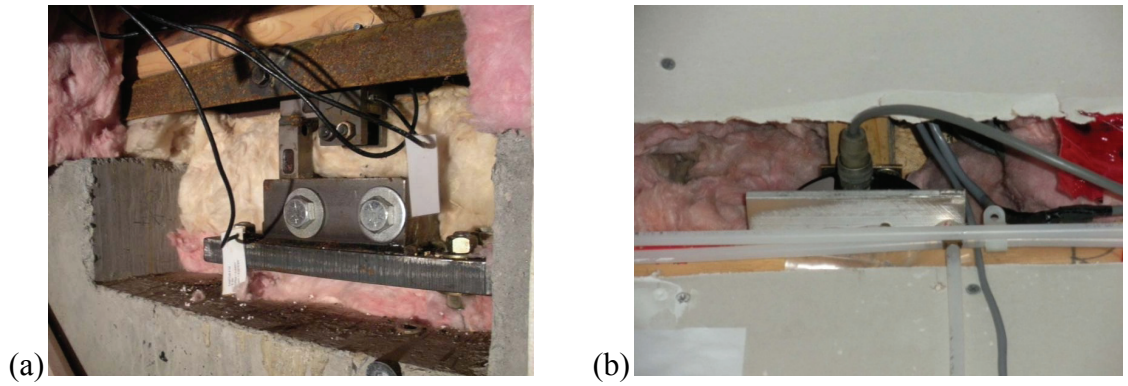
(a) Foundation and (b) roof load cells placed in the foundation to wall and wall to roof interfaces.
